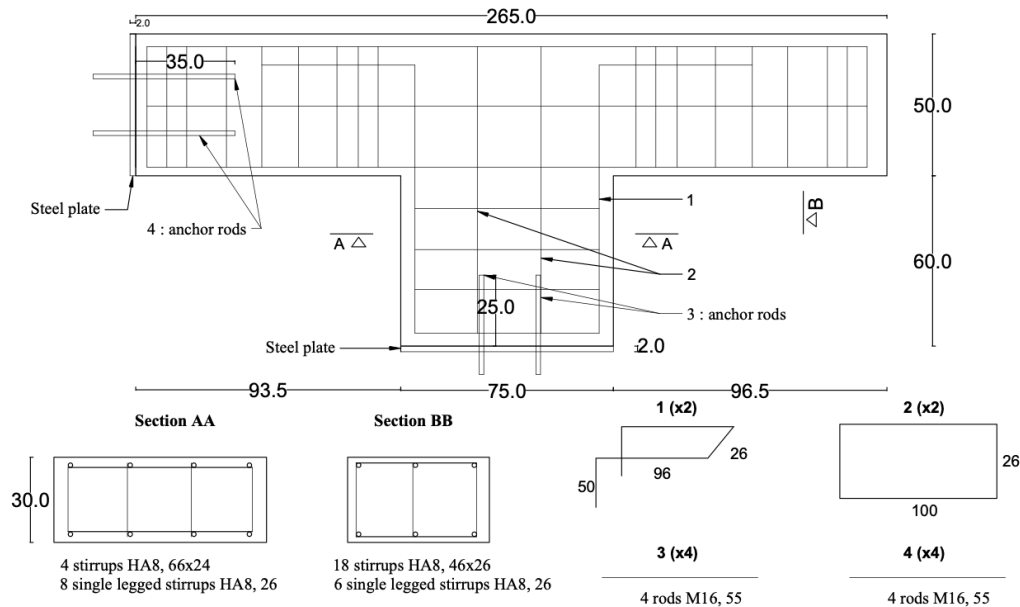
Steel reinforcement of the specimen (unit: cm and mm for rebars)
